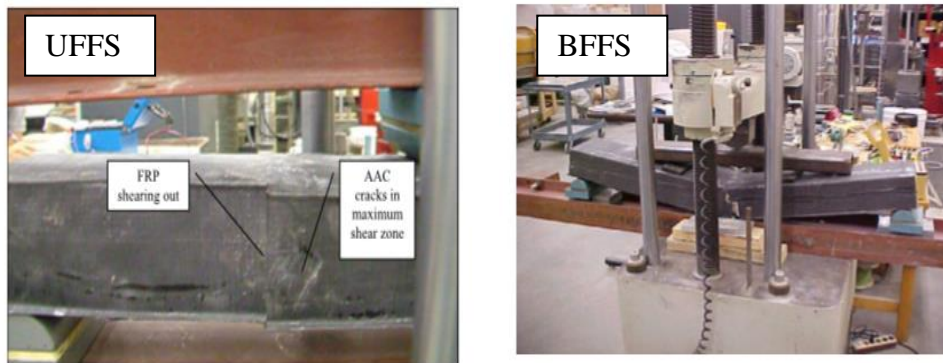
Failure mode of specimens (Mousa and Uddin, 2009)
